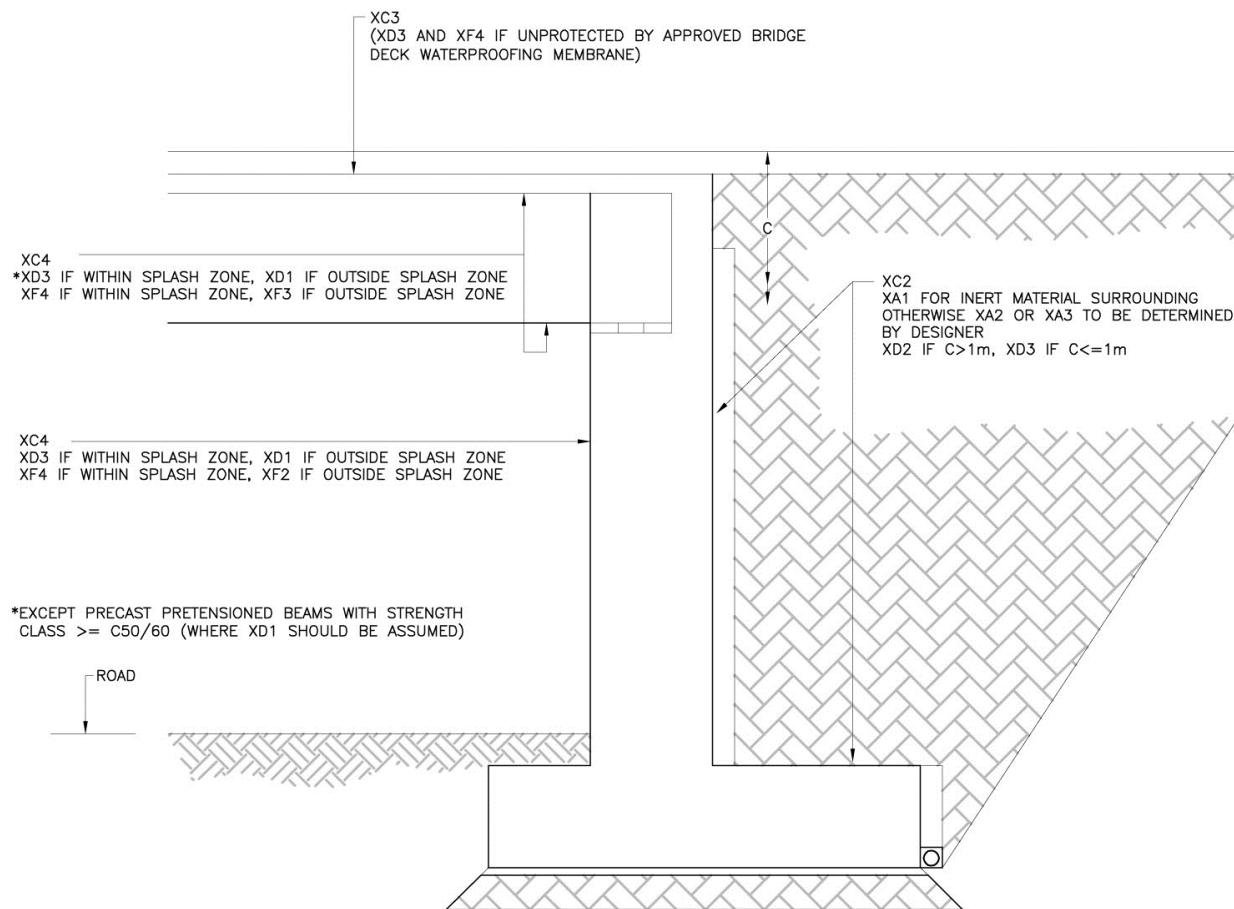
Underbridge Structure (Road Over Road) – End Support
